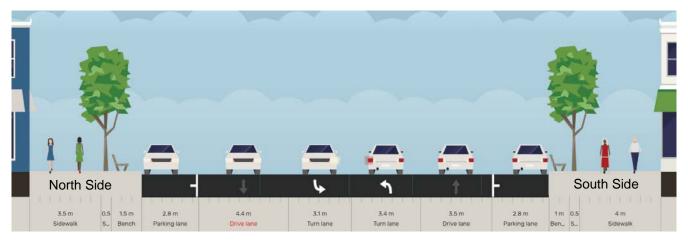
Option 1 Cross-section at John Street, Looking East
